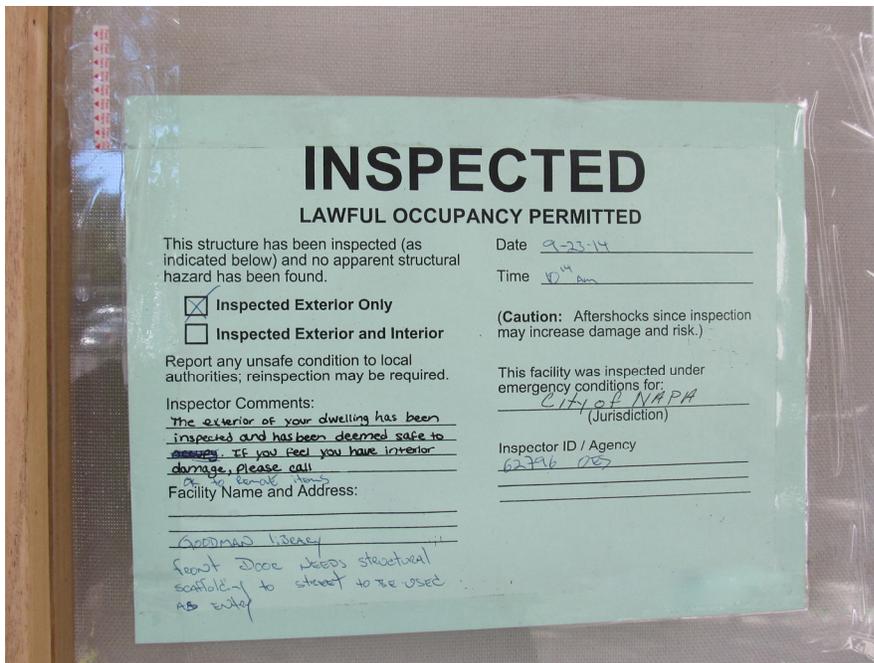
An INSPECTED placard on a building with another exit that is still restricted. A RESTRICTED USE placard should have been used.
